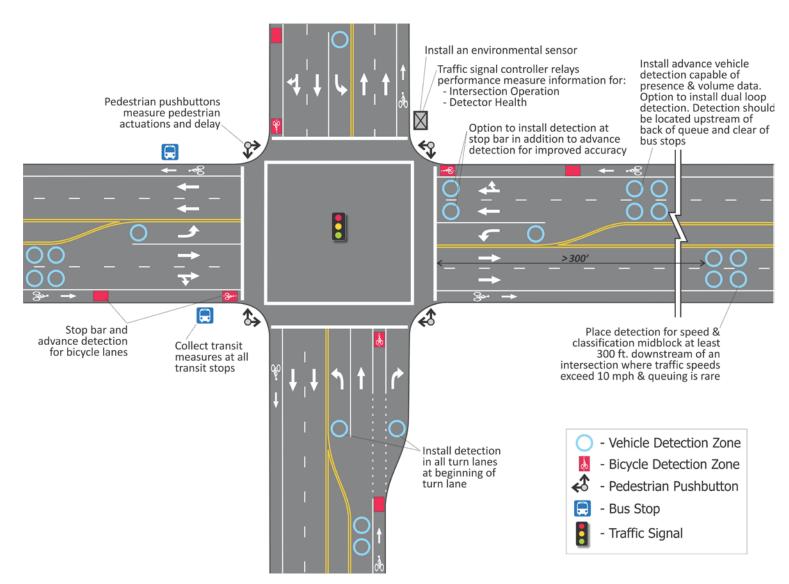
Typical field equipment layout at an arterial/arterial intersection
